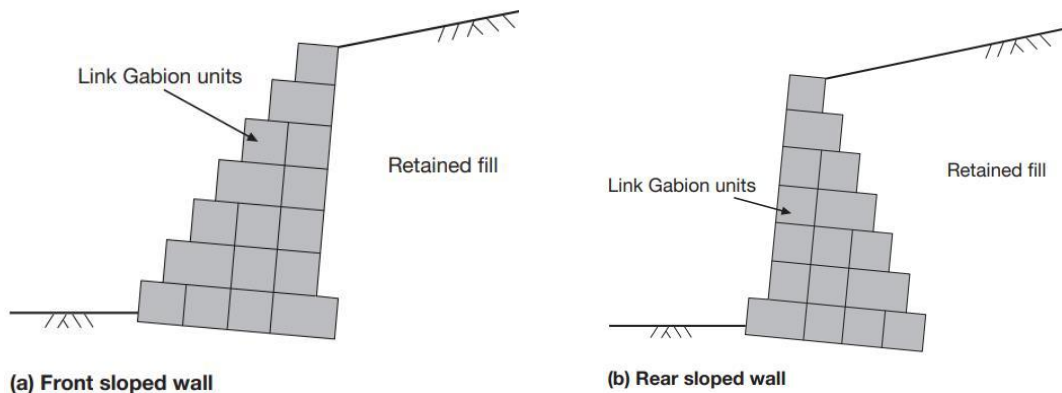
Typical front sloped and rear sloped gabion layout
